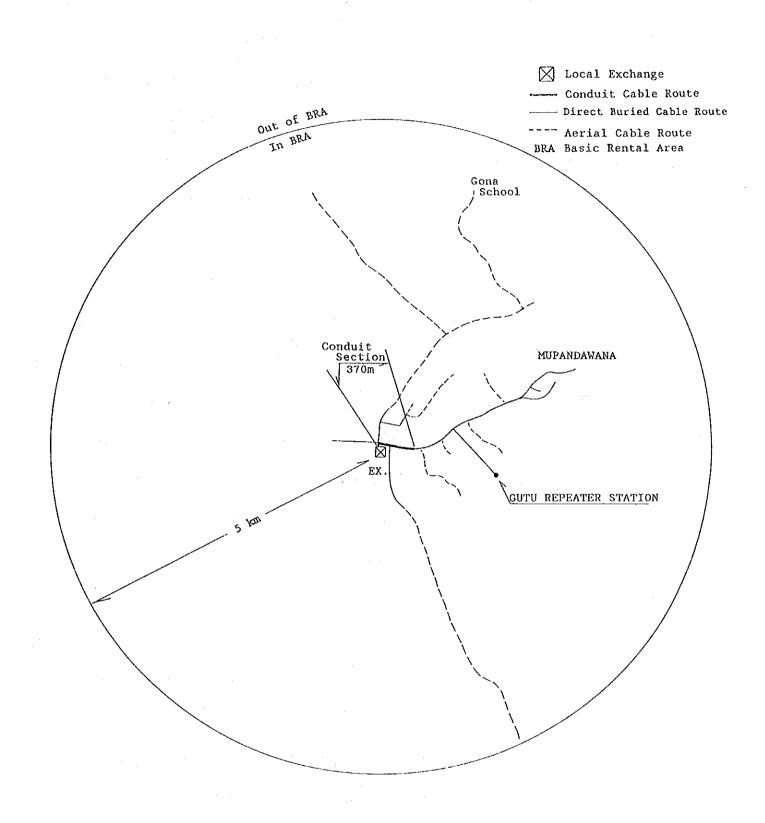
(4/6) Local Cable Distribution Plan in BRA (Gutu Exchange)
